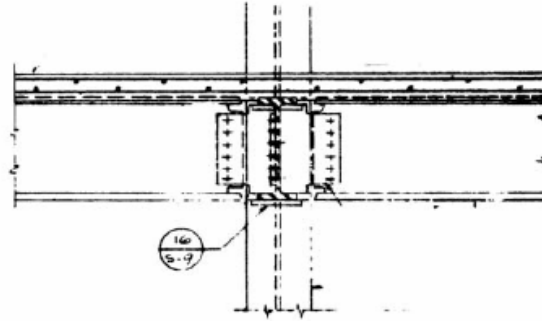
Typical Cross-Section Through the Flooring System
